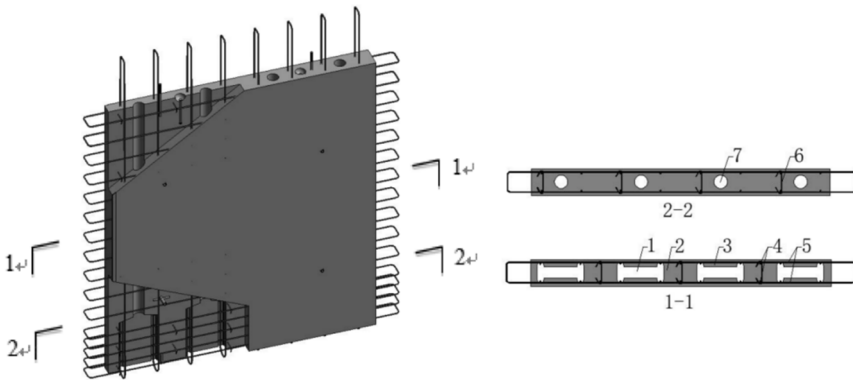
Schematic diagram of ribbed hollow wall panels with bottom cavities
